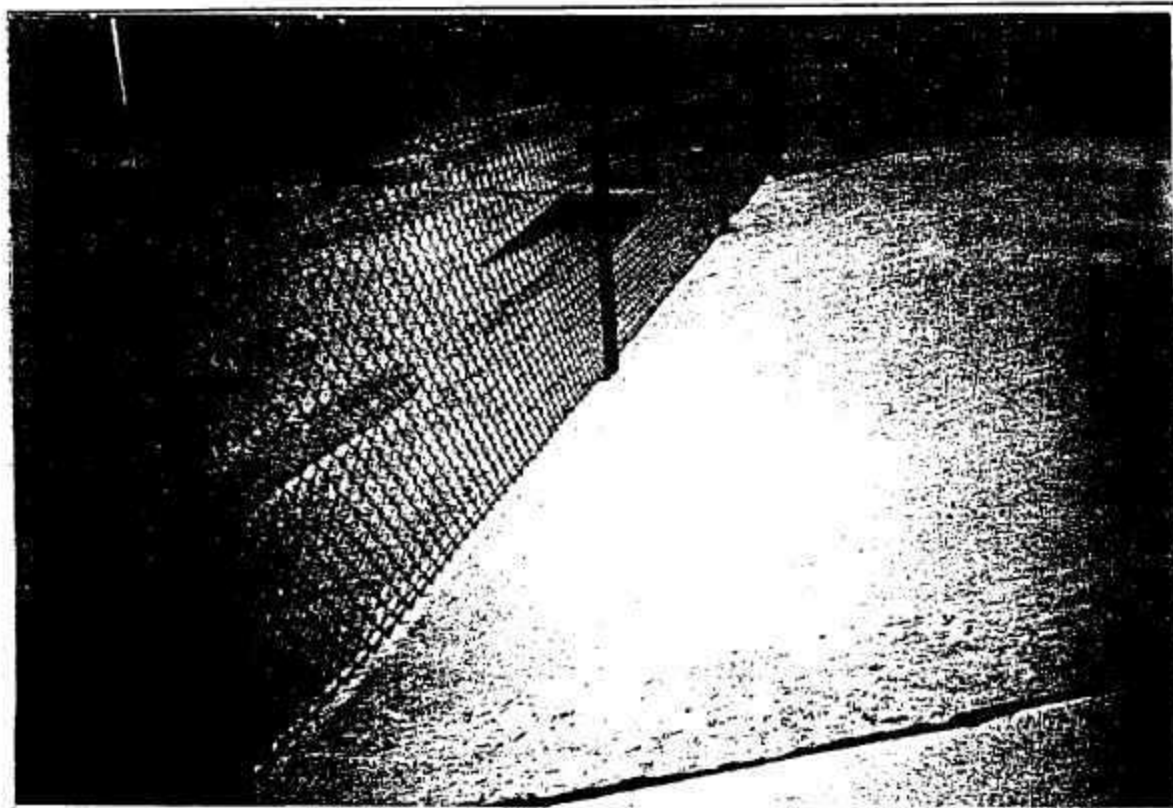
The storm drain located on the southeast corner of the site shown above. No evidence of seepage entering the drainage pathway along the east perimeter of the site was noted. Photo taken facing southeast.
